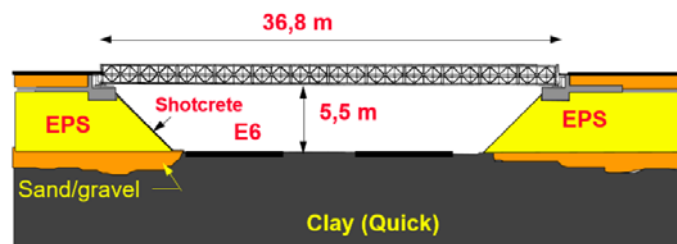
Bridge abutment founded directly on Geofoam blocks (NPRA)
